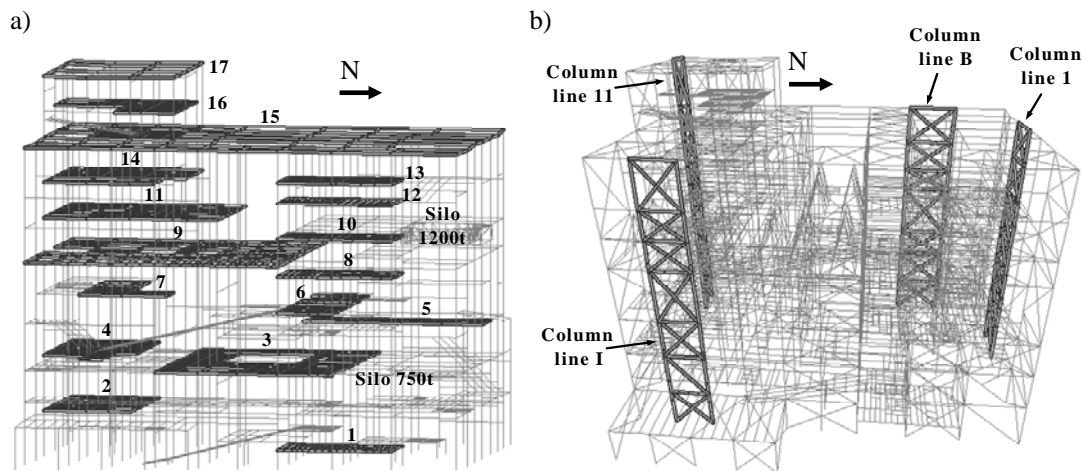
Analytical model in STAAD.Pro: a) Location of platforms; b) Elevation of the braced frames studied.
